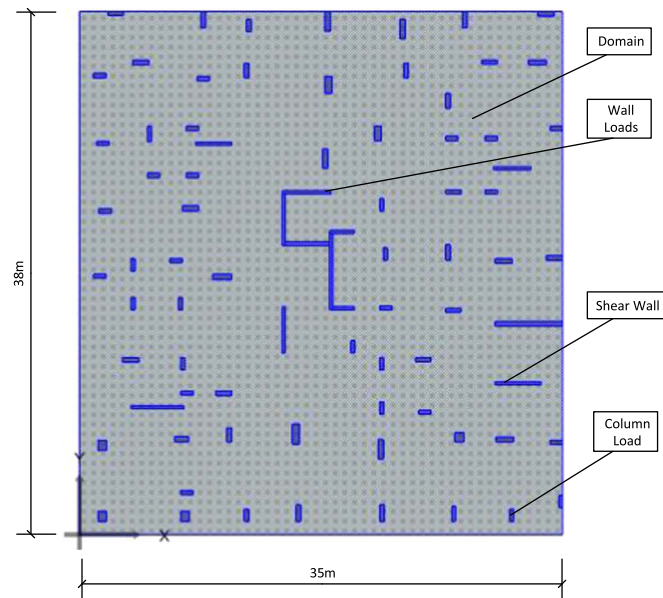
Case 3, Building slab with a multitude of beams, columns and drops.
